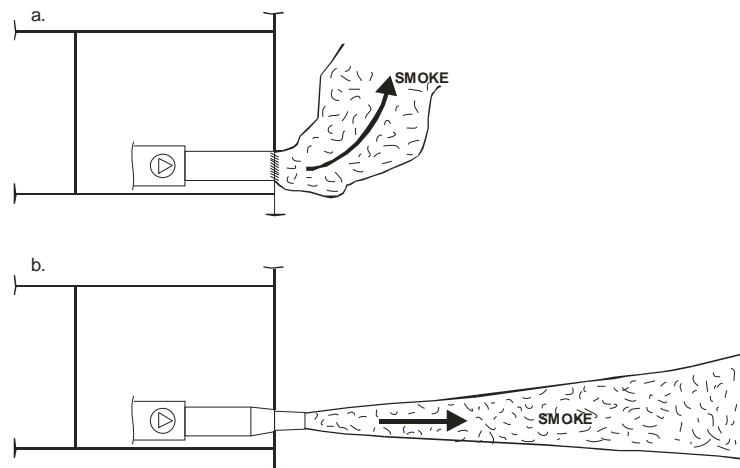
Smoke outlets. a) shutter type outlet, b) long throw jet type outlet.
